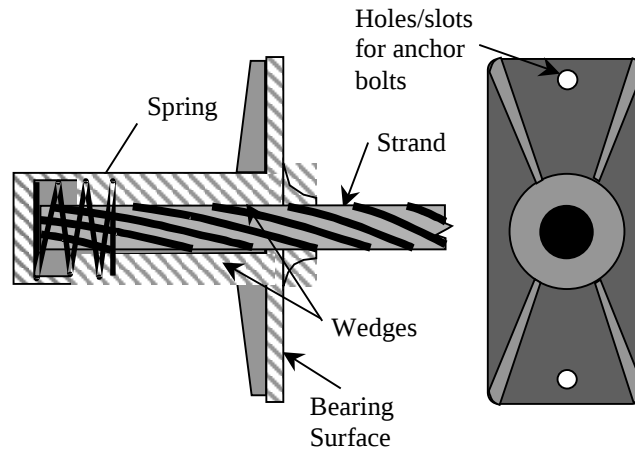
Spring-loaded post-tensioning anchor for precast pavements⁽³⁾.
